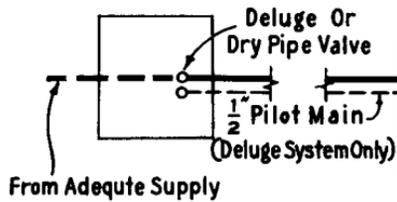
Typical deluge or dry pipe fire protection arrangement for counterflow towers.
